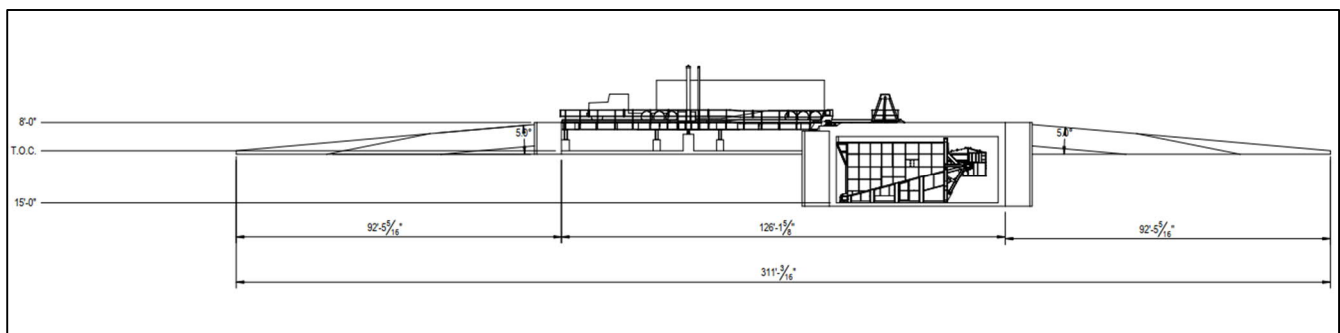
Section View of a Drive Over Truck Tipper with Below Grade Dumper Hopper, with Ramps (courtesy of Bruks)
